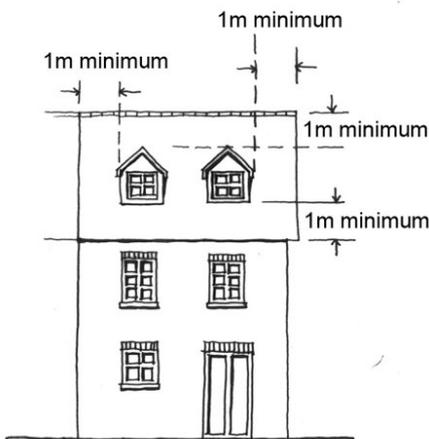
Dormers should be set below the ridges, set above the eaves and set in from the boundary and the edge of the roof.
